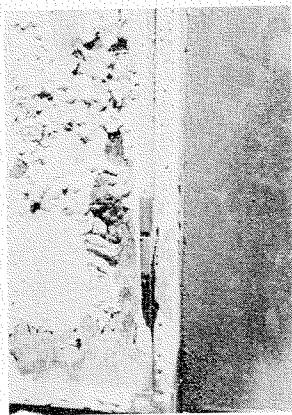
VAH1 Test Sample Showing the lower hinge damaged.
